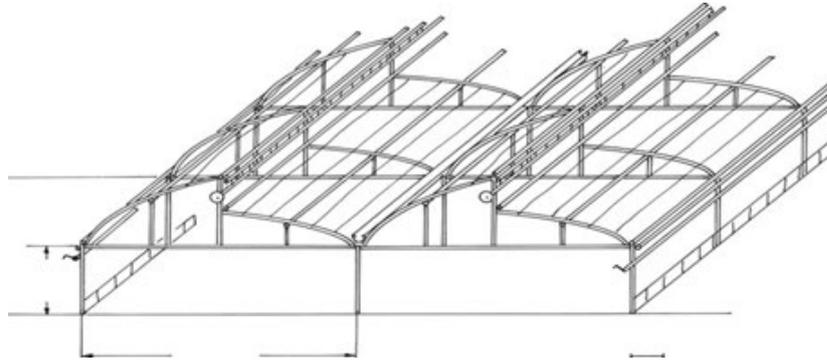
Multi-span greenhouse with roll-up side wall ventilation and roof ventilation linked to gutter and ridge
